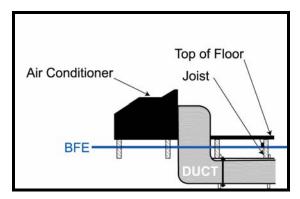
Just focusing on getting the lowest floor above the base flood elevation (BFE) means that floor joists and ductwork may still be flooded.
